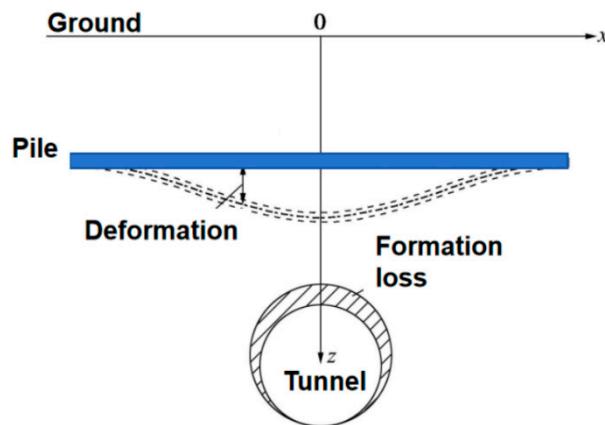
Schematic diagram of pipeline deflection caused by shield tunnel excavation.
